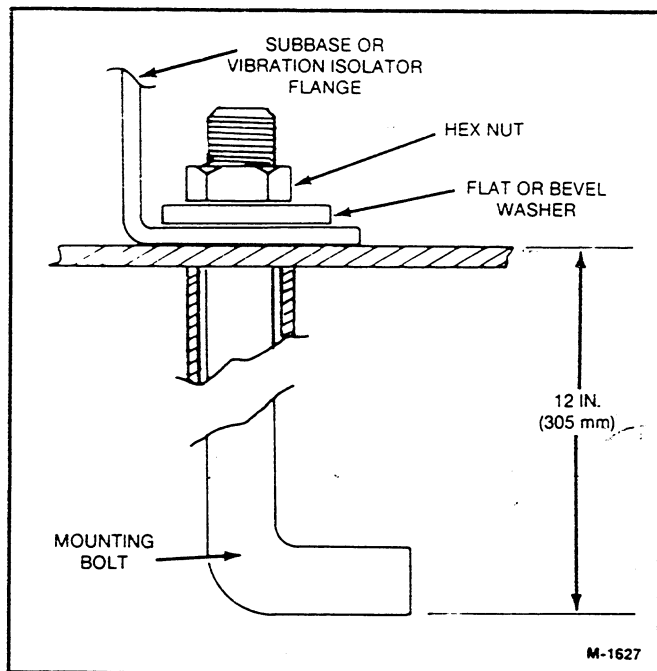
TYPICAL ANCHOR BOLT DIAGRAM
